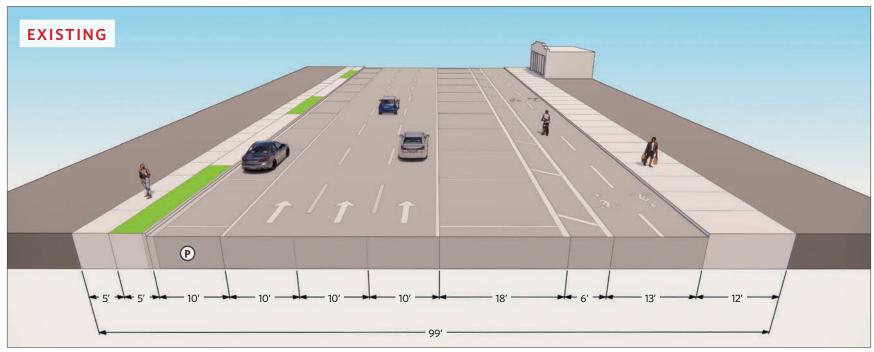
Existing Street Section for W. Michigan Avenue, Looking East
